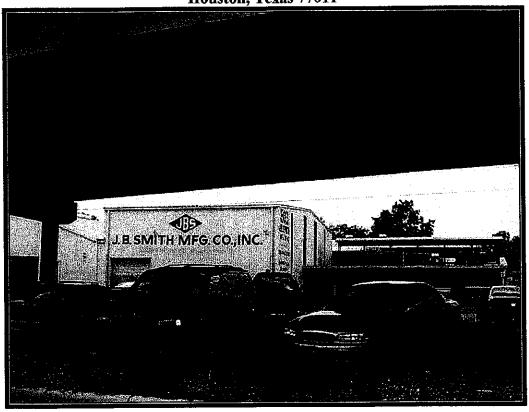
View of parking beneath the Navigation overpass across the frontage road.
